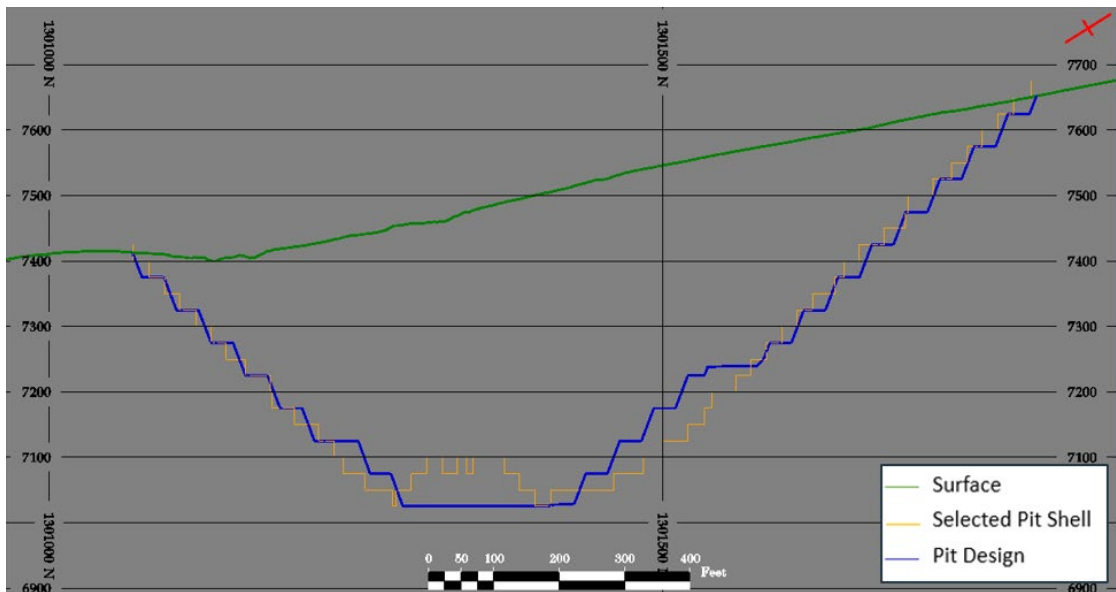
Section B Showing Mine Design and Selected Pit Shell – Beartrack South Pit (Source: Wood, 2020)
